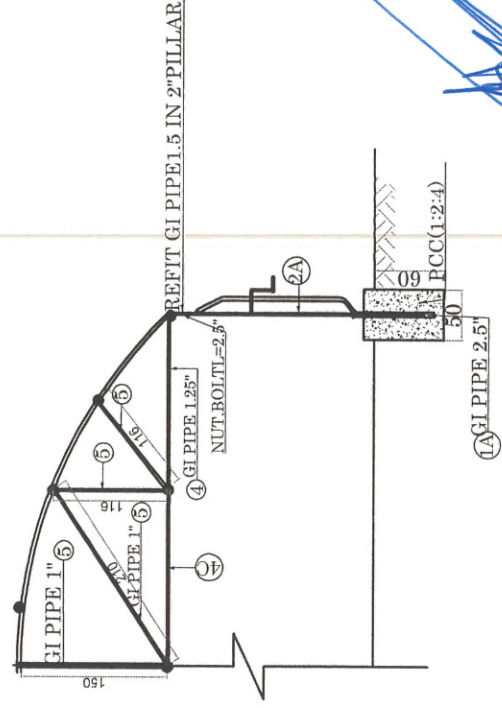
DETAIL OF CENTER PILLAR FOR FRONT AND BACK SIDES OF GREEN HOUSE
